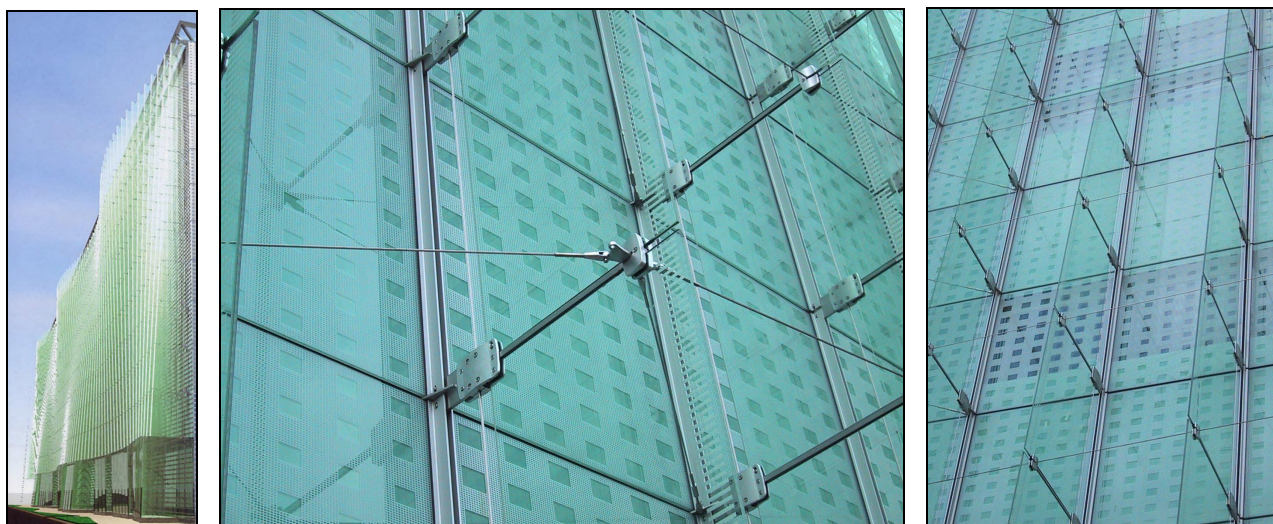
Example of an “oscillating glass façade” with point-supported and locally clamped glass fins, supported by horizontal cables [1]
